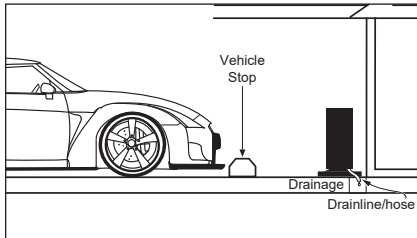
If located near a driveway, install a vehicle stop to avoid damage to the heat pump.
